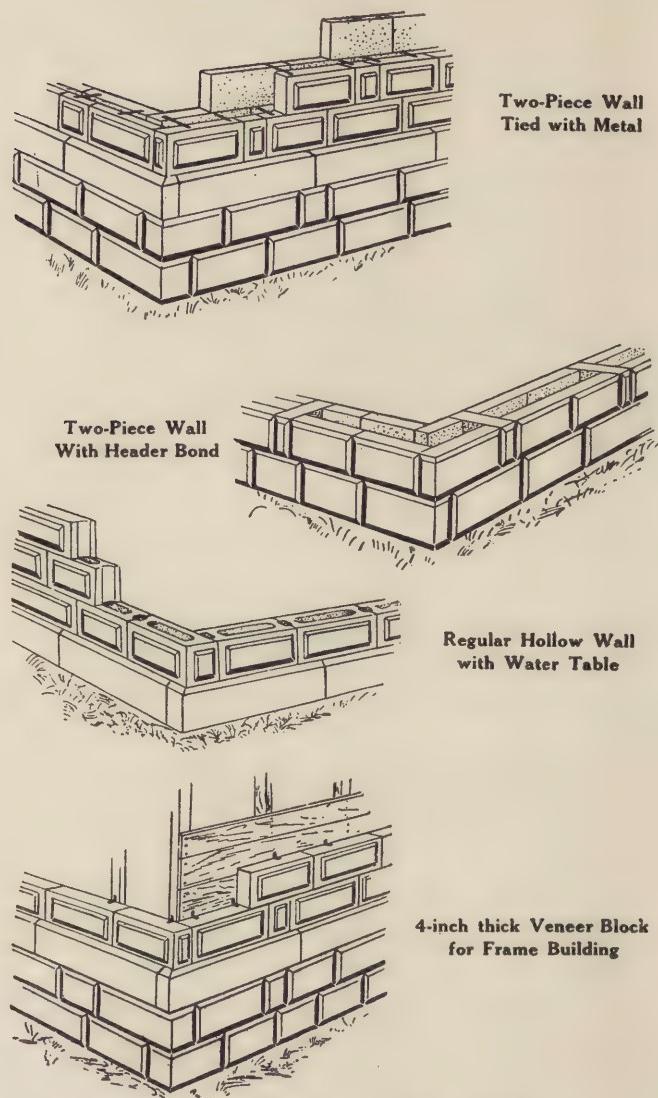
Typical Examples of Concrete Block Wall Construction.
